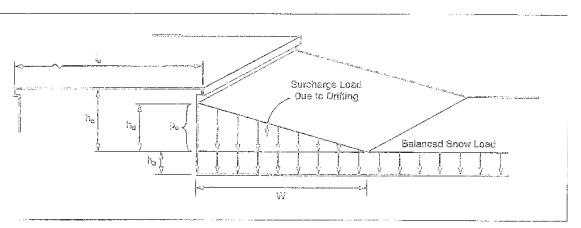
Configuration of Snow Drifts on Lower Roofs.
